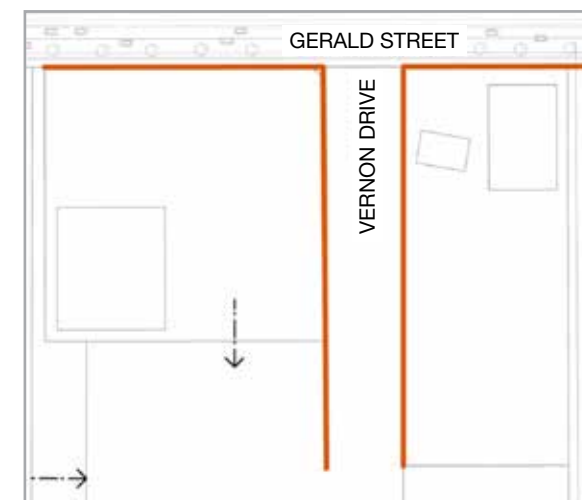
Retail Core (West) Precinct - Building lines and active frontage
